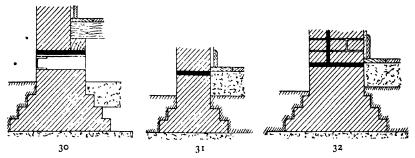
Horizontal damp course with means of ventilation to hollow floor.
